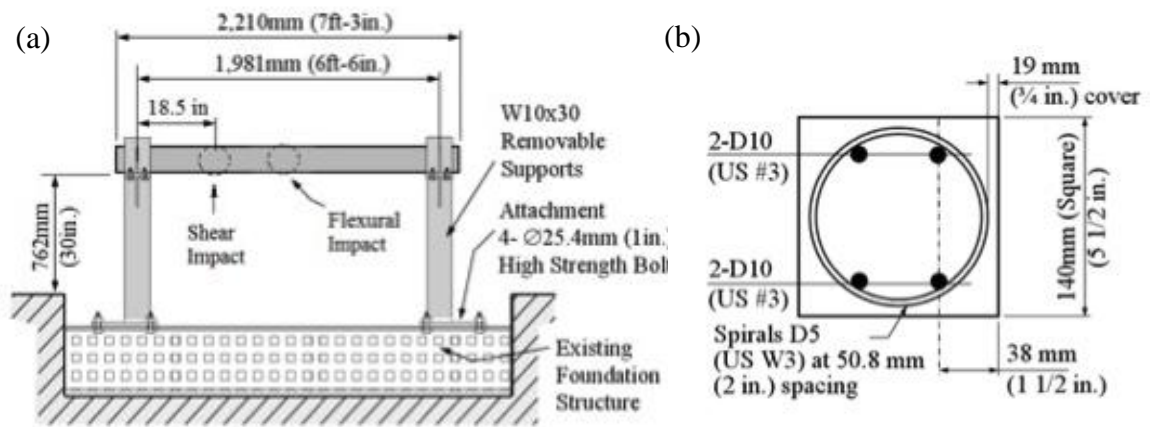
(a) Specimen support structure and (b) cross sectional dimensions and reinforcement arrangement
